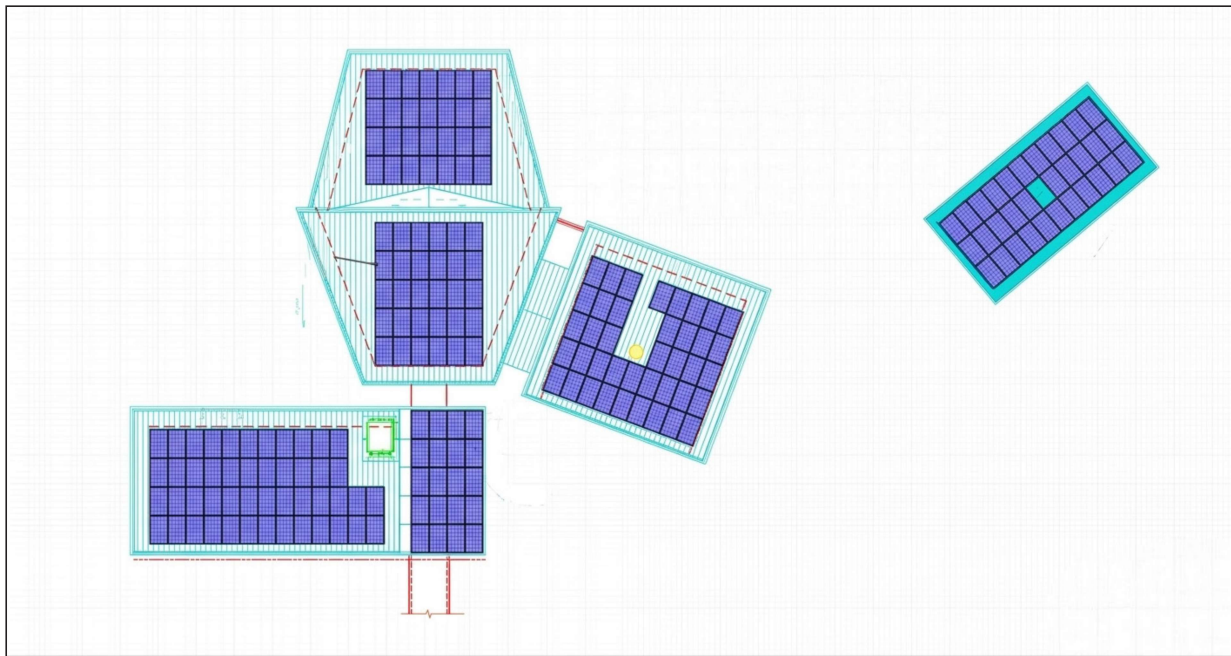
Pavilion building rooftop solar layout. Designs courtesy of Shield Ranch.
